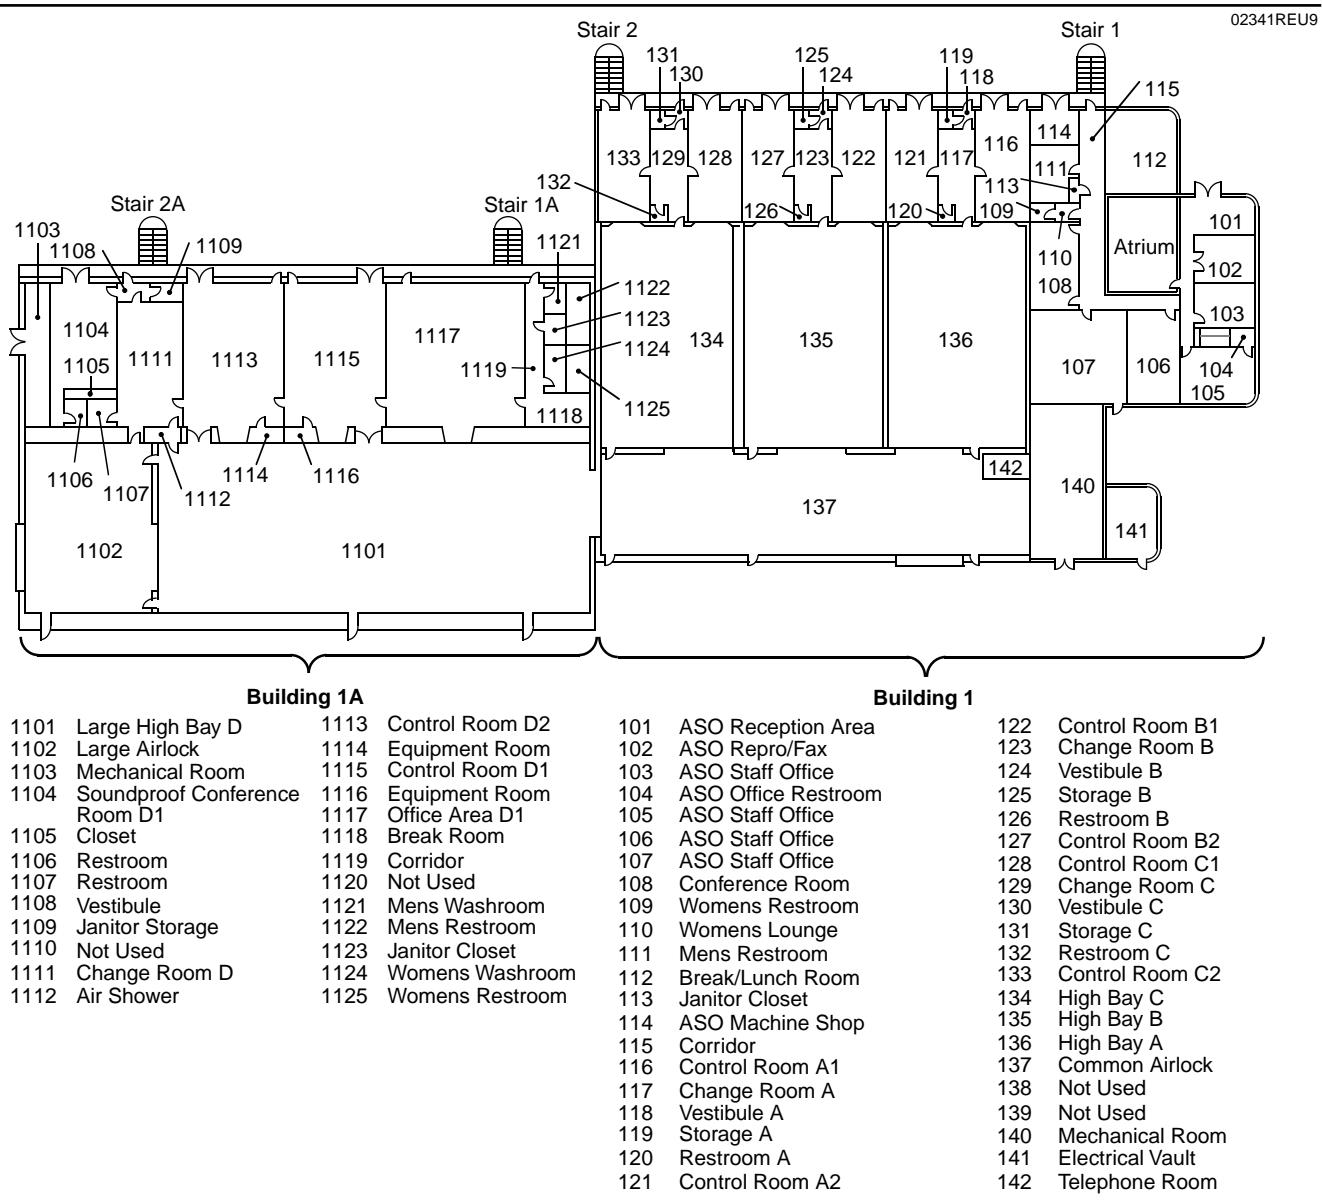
First-Level Floor Plan, Building 1/1A Astrotech
